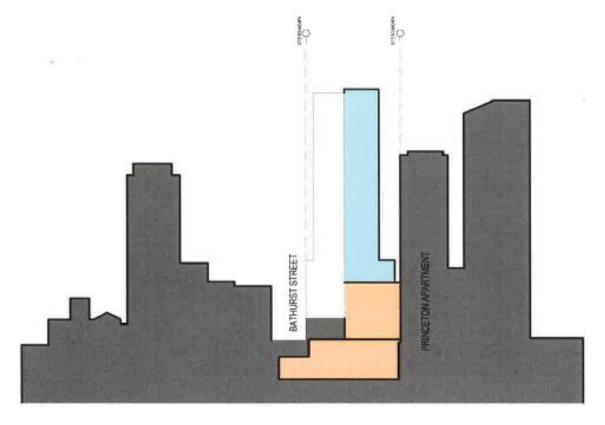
Pitt Street South concept SSD DA - North-South section [Source: SSD 8876 Concept Stamped Plans]
